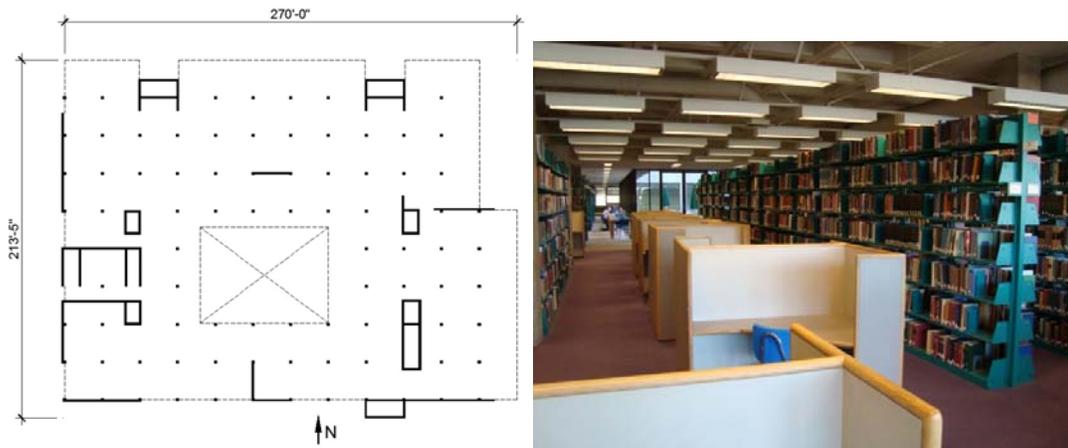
2nd floor plan of building; typical arrangement of furniture and books
